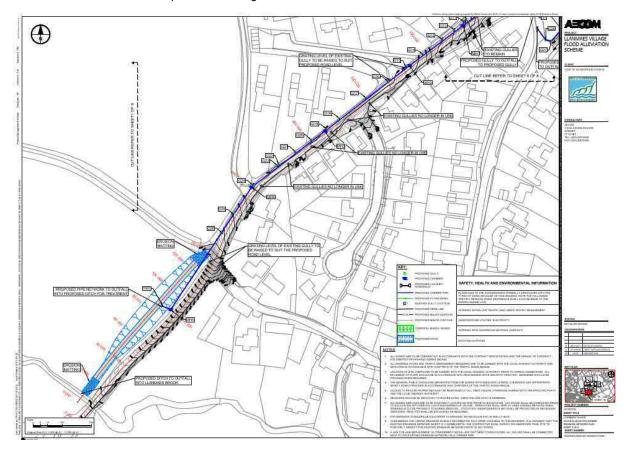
Road Reprofiling with New Gullies and Carrier Pipe Discharging to Ditch 3
